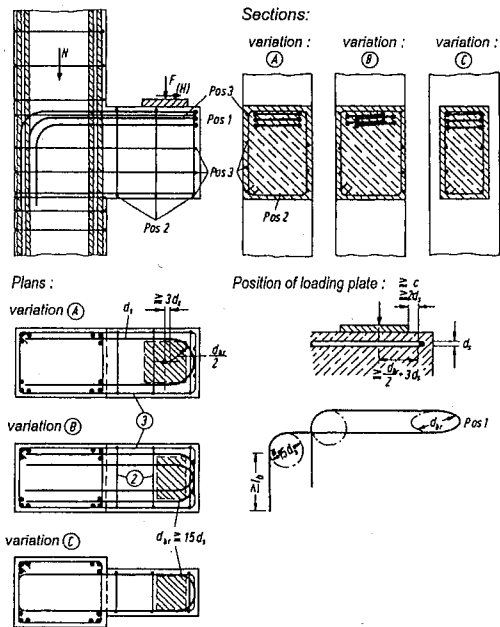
Detailing of a corbel at a column with a short anchorage length according to Schlaich and Schäfer (2001)
